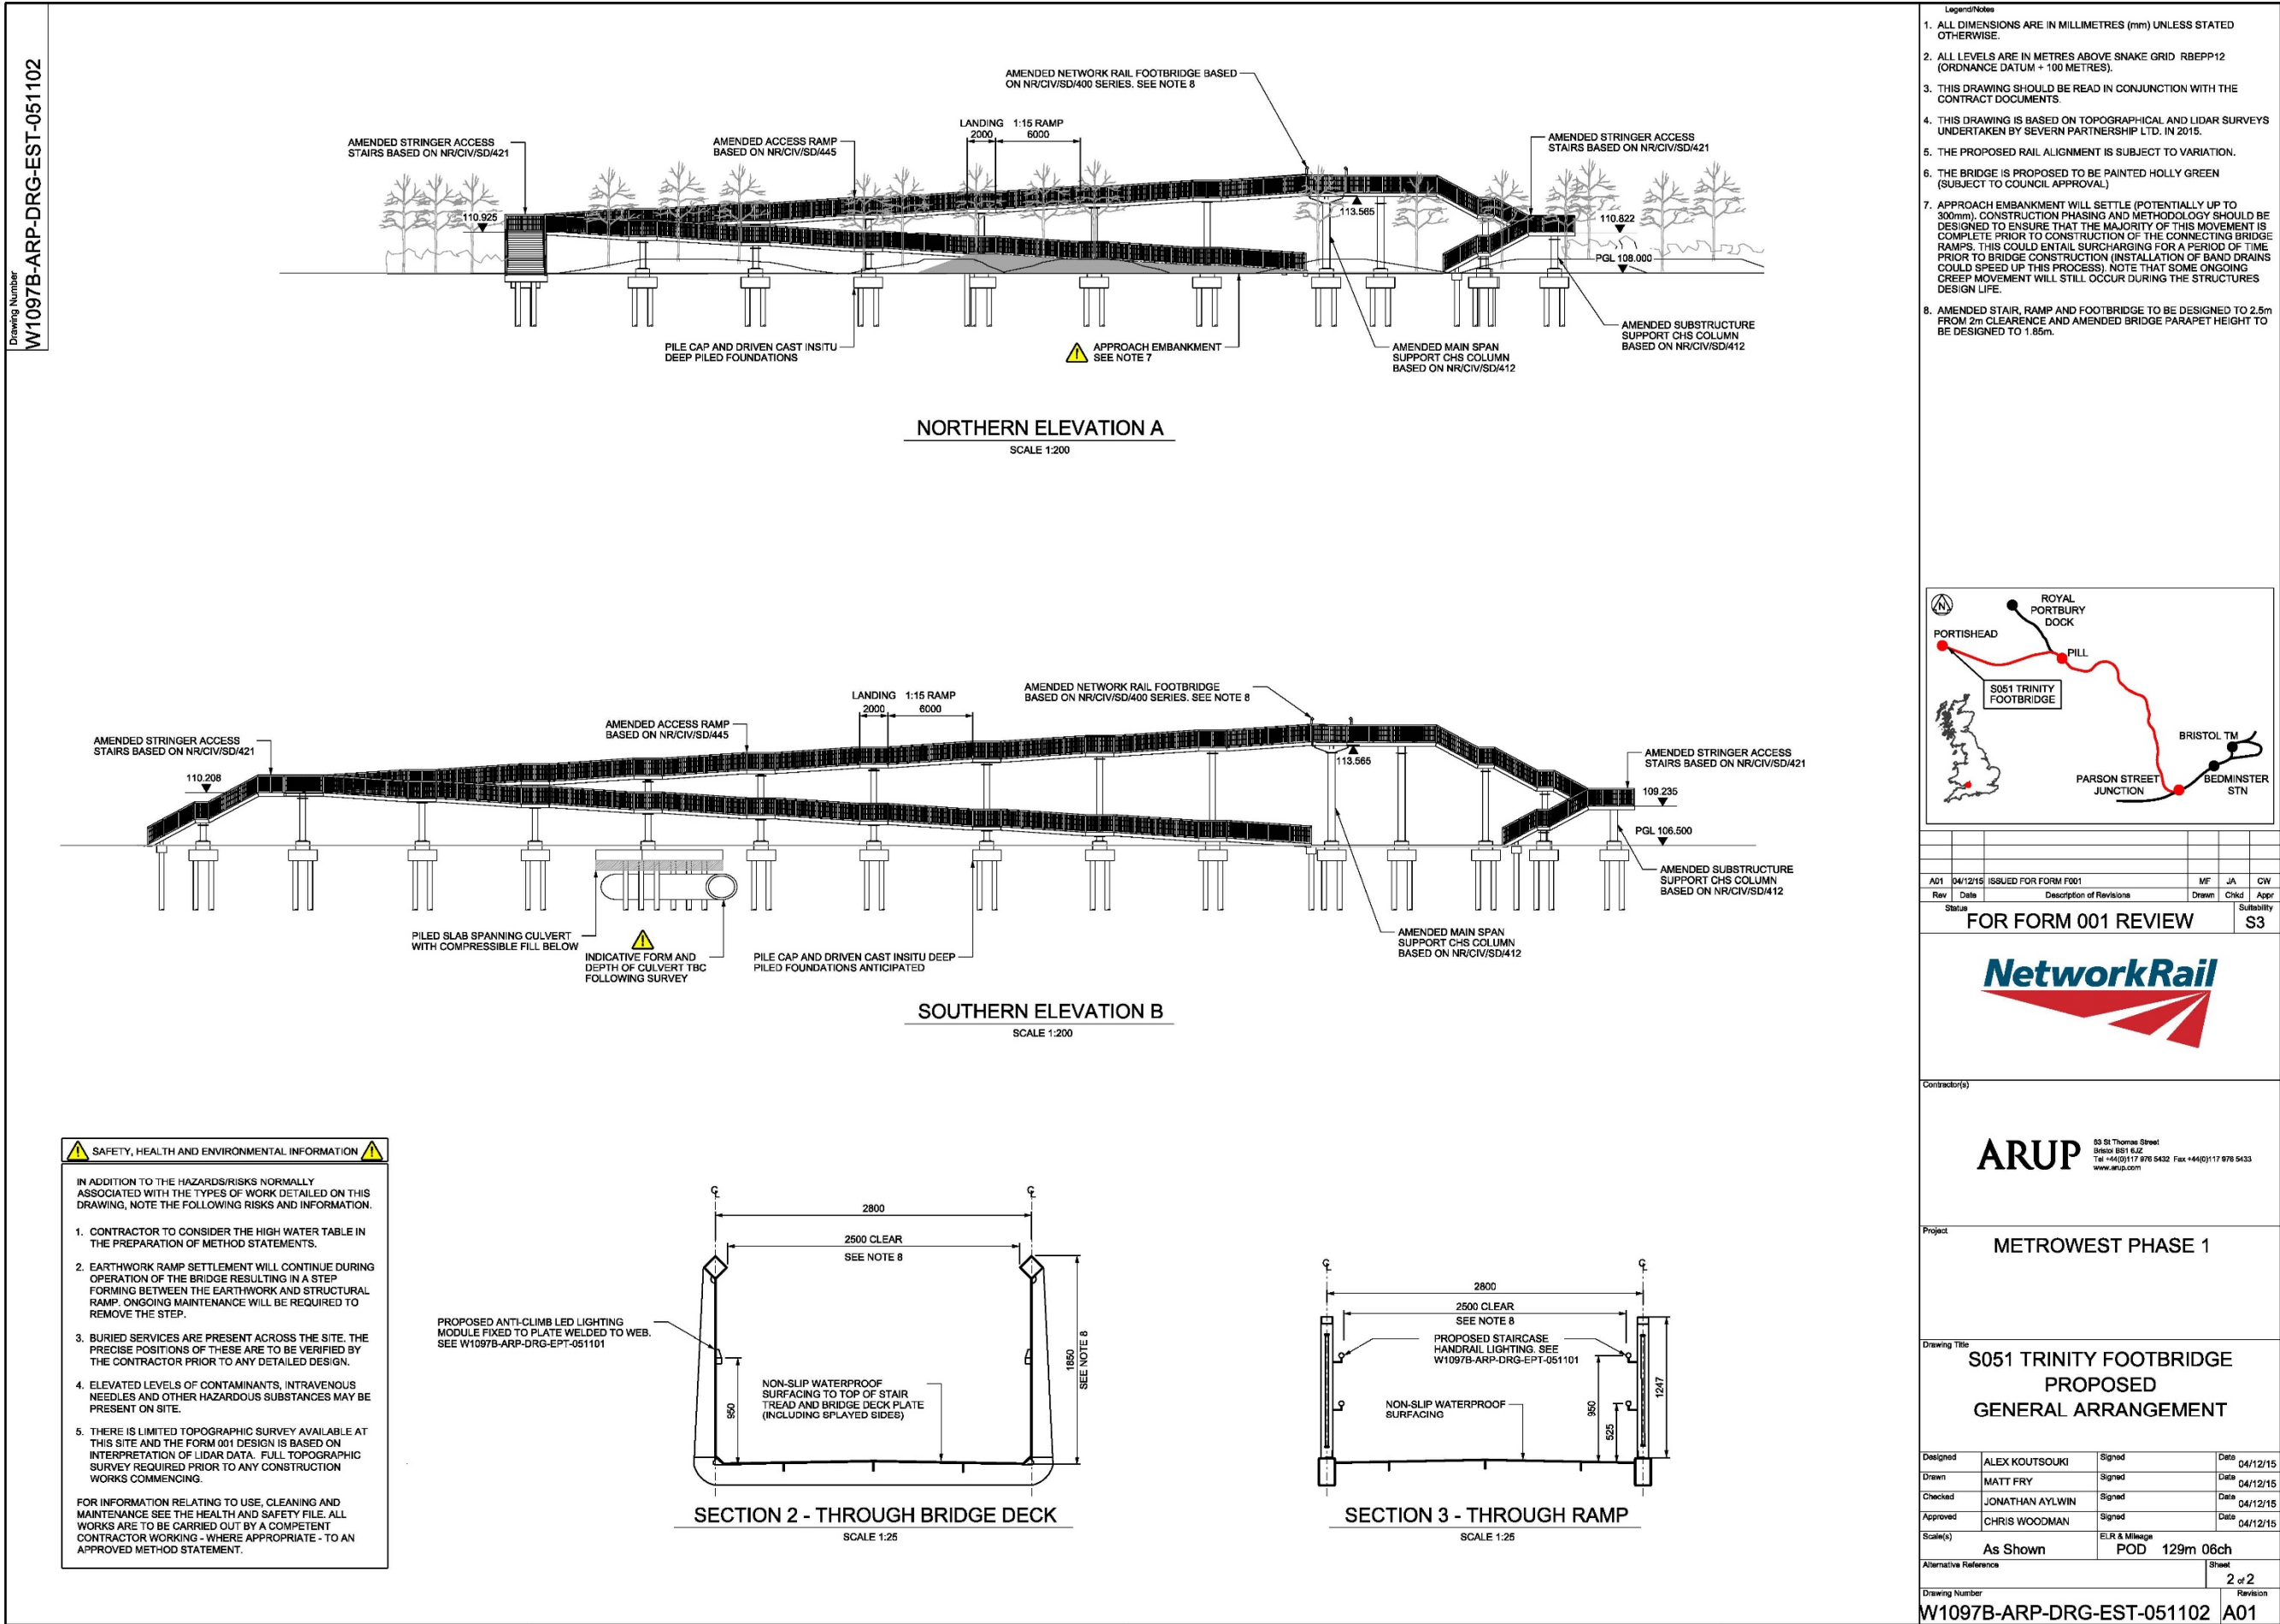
Trinity Pedestrian Footbridge General Arrangement (sheet 2)
